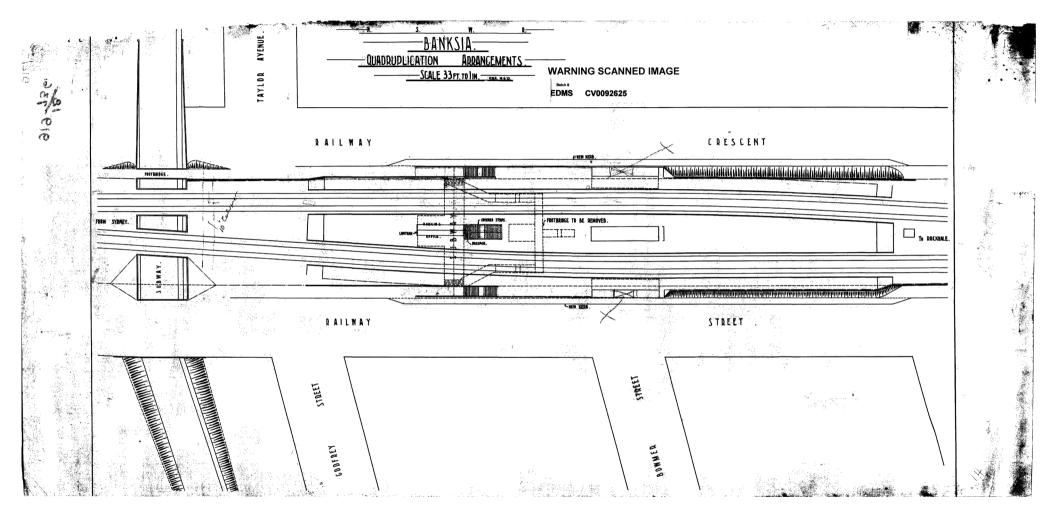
Banksia Station completed quadruplication arrangements, c.1923 (Source: Source: Sydney Trains plan room)
